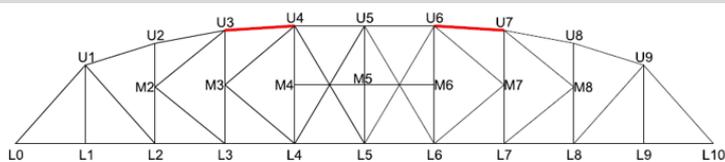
Overstressed Truss Members (Span 3) – Rehabilitation with Widening
